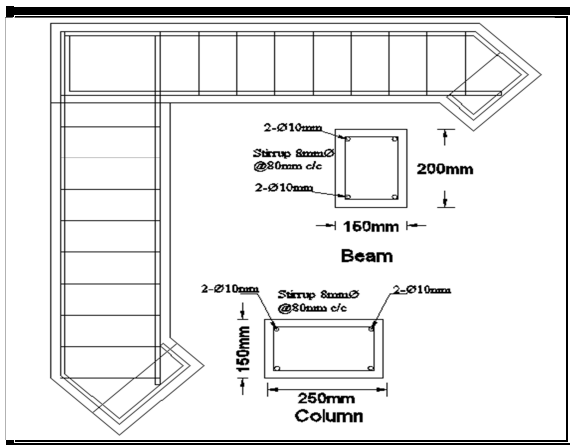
Dimensions and reinforcement detail of the corner Beam-Column joint specimen.
